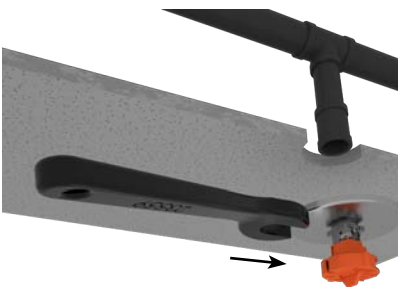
Recessed Installation (with Recessed Socket Wrench)
